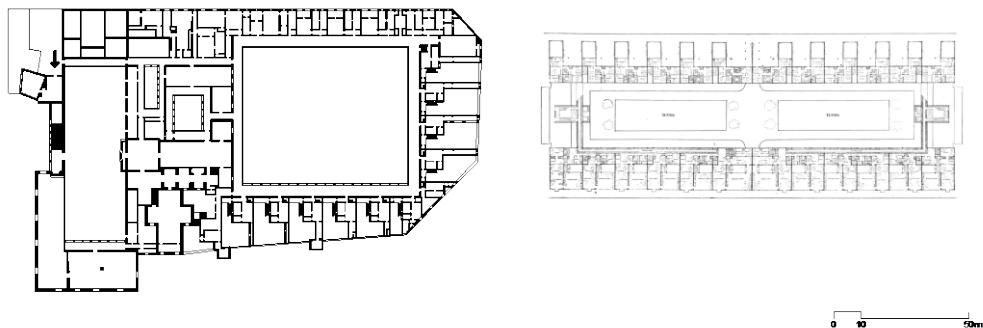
Plan of the Ema Valley Charterhouse and plan of the Immeuble-villas
